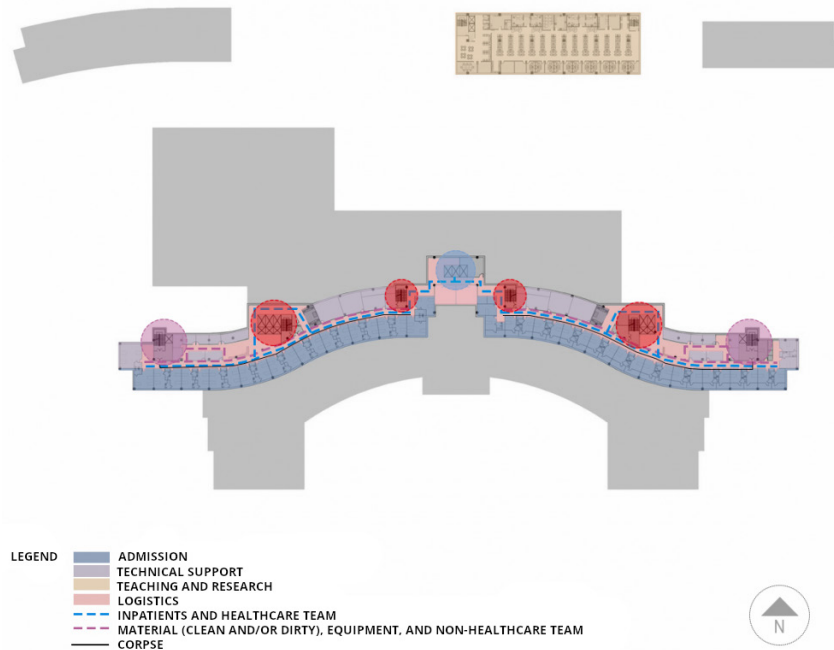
Reference floor plan at Suzhou Children's Hospital
